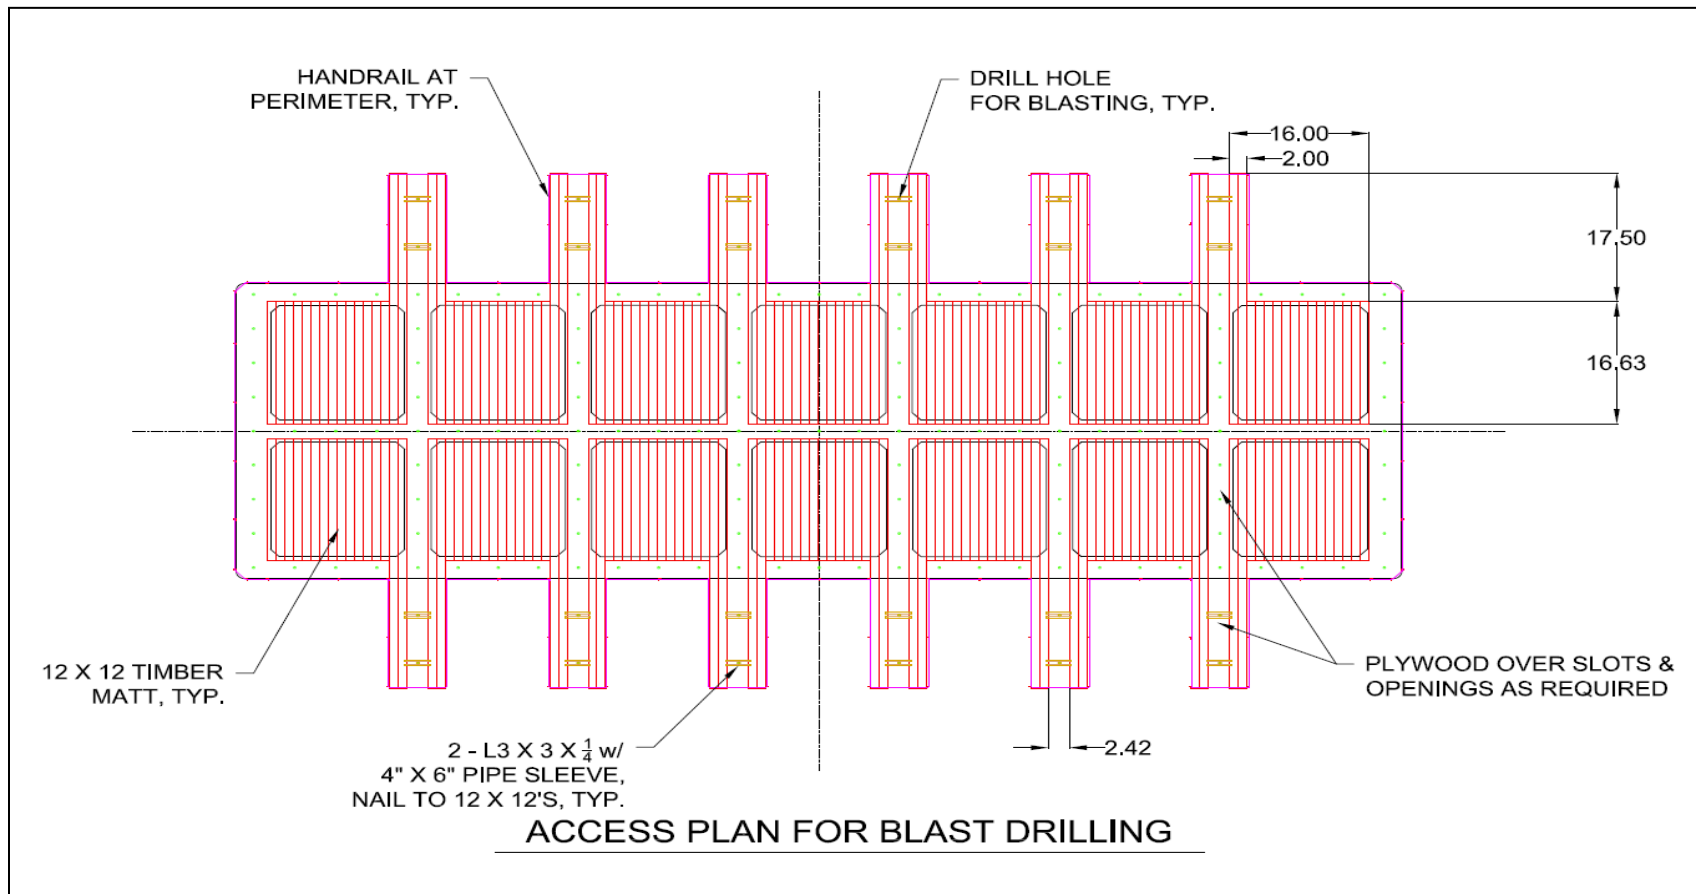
Pier E3 drilling template schematic. Plan view shows installed platforms over all inner cells to support drilling equipment and installed overhang template system to facilitate drilling activities below the waterline.
